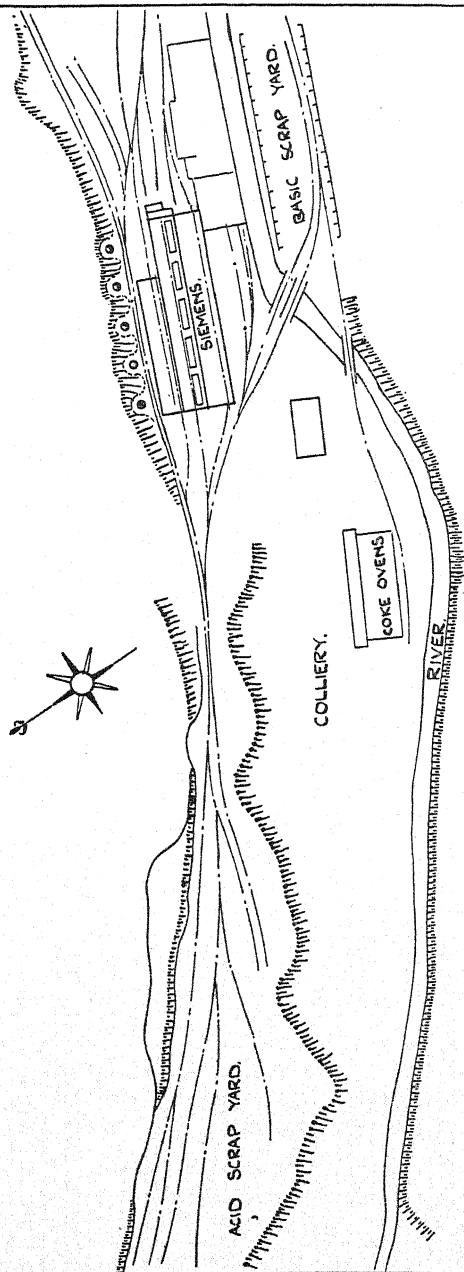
SITE PLAN OF SIEMENS MELTING SHOP AND SCRAP YARDS.
